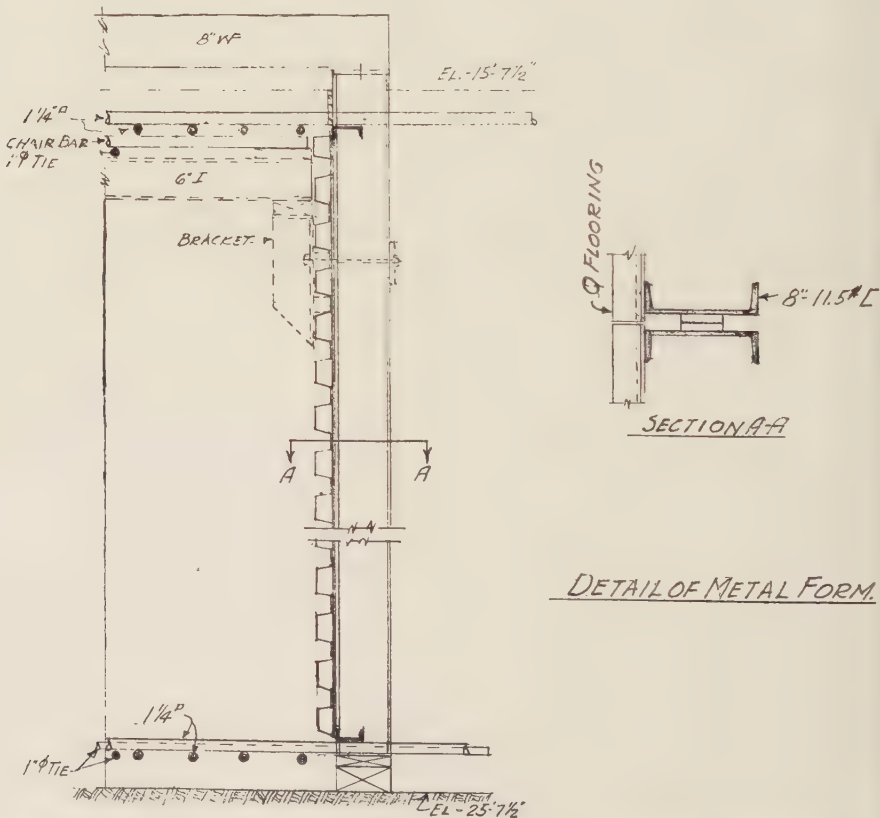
TYPICAL CROSS SECTION THROUGH A FORM FOR CONCRETE FOUNDATION SLAB.
